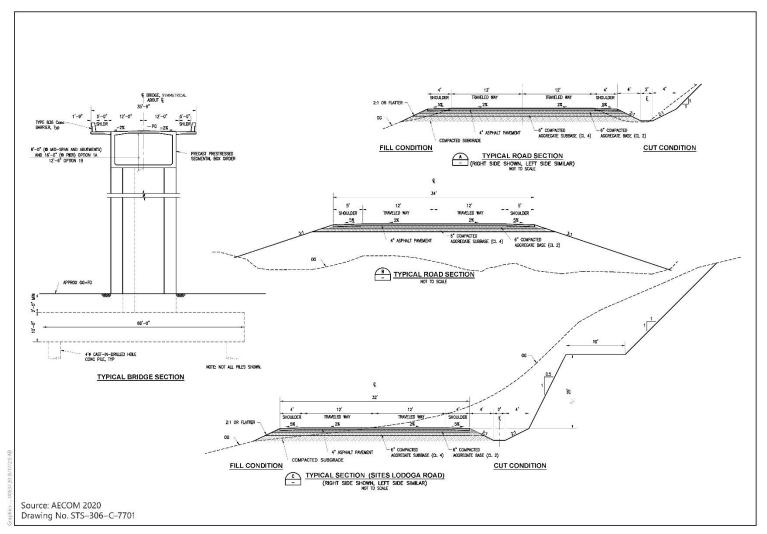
C-58 Sites Lodoga Road Realignment and Bridge
